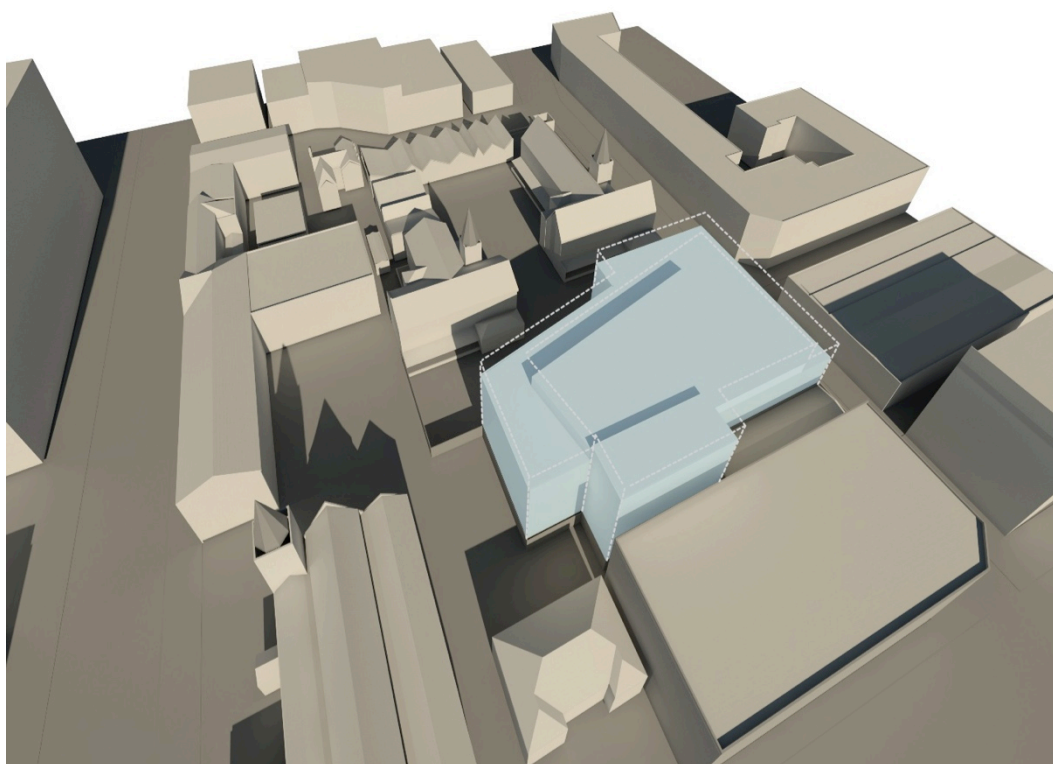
Extract from the Architectural Plans showing a 3D view of the proposed envelope (dotted white line) and the Indicative Study Building (light blue) in the context. The diagram illustrates the “loose fit” of the envelope, which is considered essential to enabling a high design quality for the next stage (building design). The form shown to the bottom right of the Proposal is a permissible envelope for the UNDA owned site on the corner of Broadway and Buckland Street currently a single storey structure.
